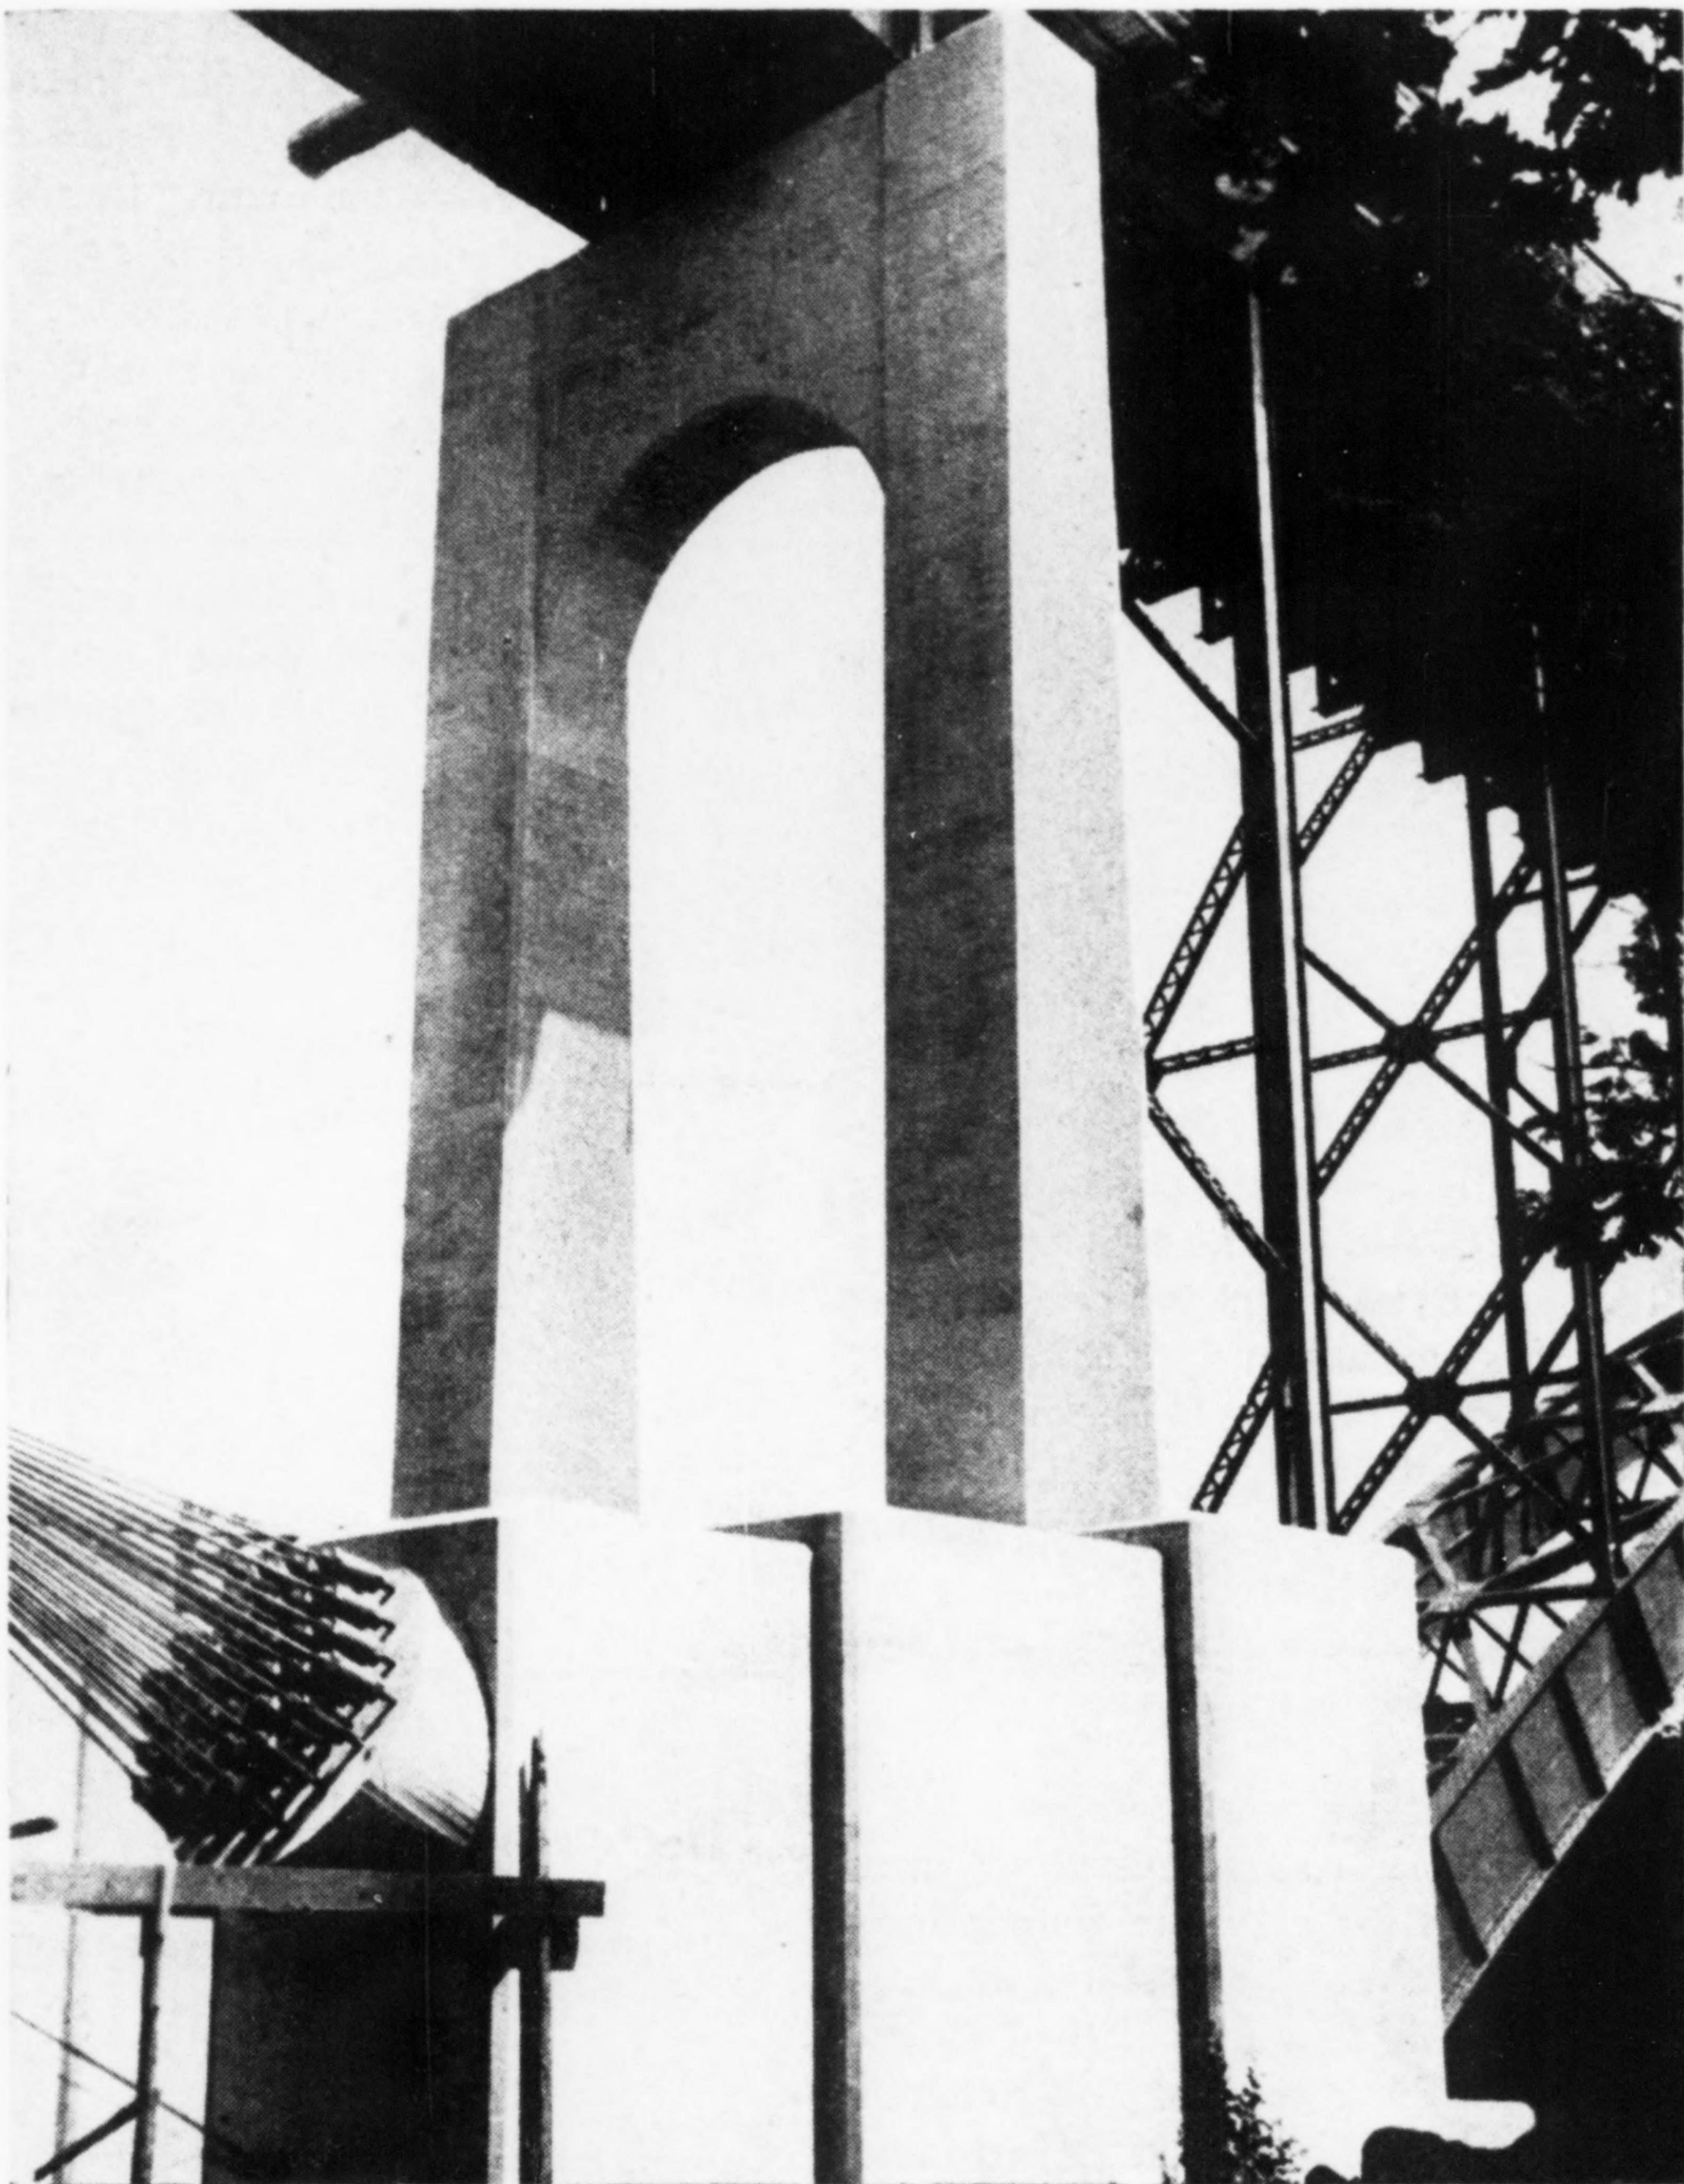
Combination cable anchorage, arch abutment and viaduct pier base in the Canadian group of structures.
